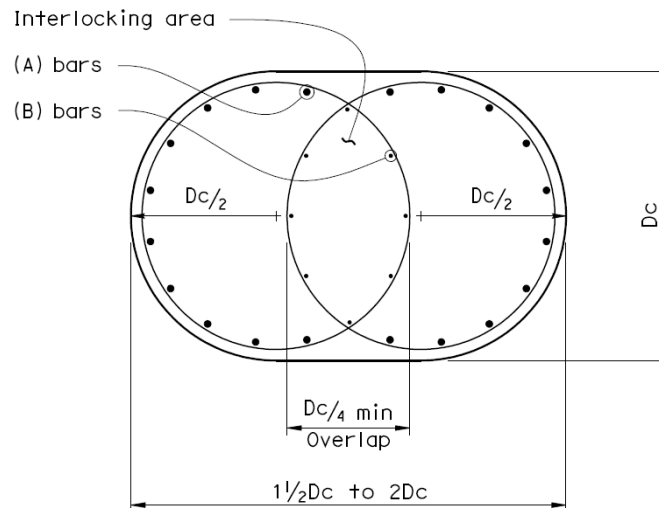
Vertical Reinforcement Within Interlocking Hoops
